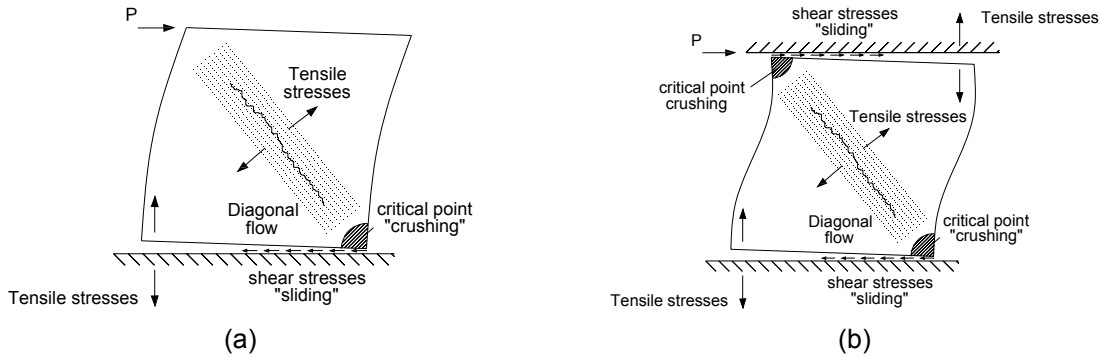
Possible crack patterns due to in-plane horizontal loading (a) cantilever shear walls and (b) fixed-fixed end shear walls.
